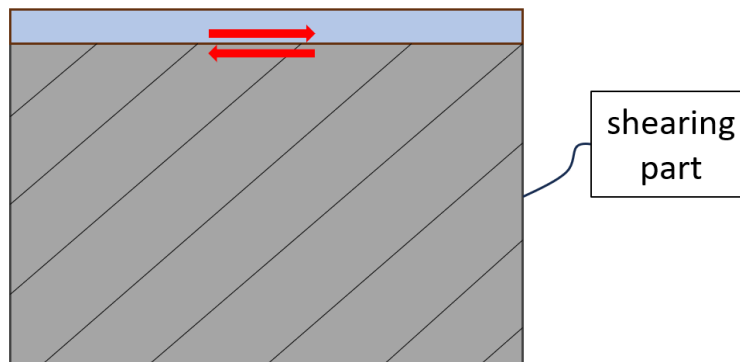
Longitudinal shear of the connection between concrete core and steel plate
